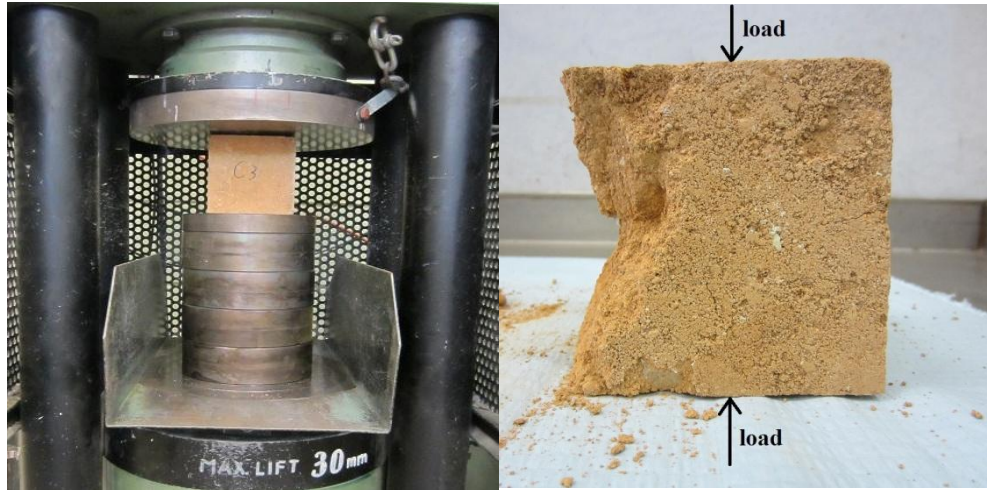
Compression test setup and typical failure pattern of cubic specimens
